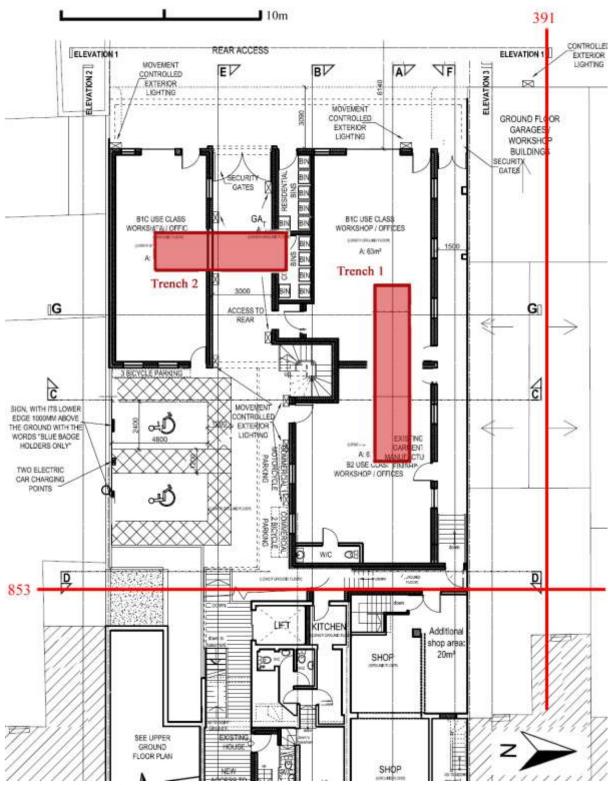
Plan of the trial trenches (red) overlain onto the proposed ground floor and lower ground floor plan (adapted from drawings provided by Brian Blanchard, Eurodime Ltd, 2018), tied to the OS grid
